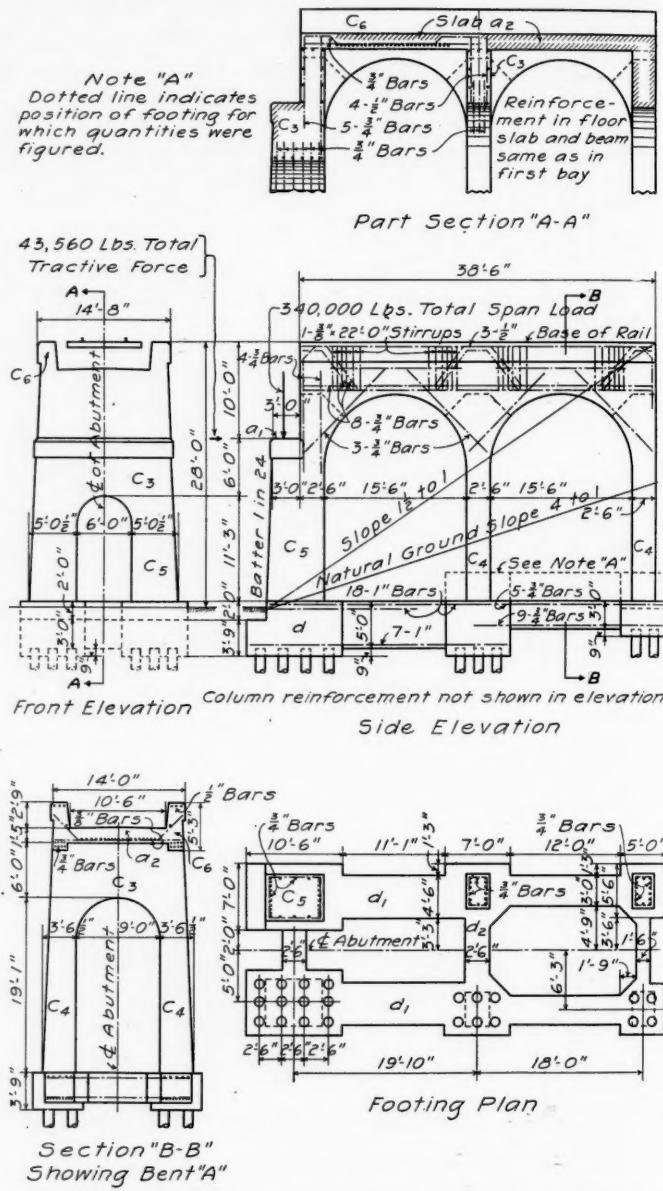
Type C₃; Reinforced Concrete Arch Abutment.
